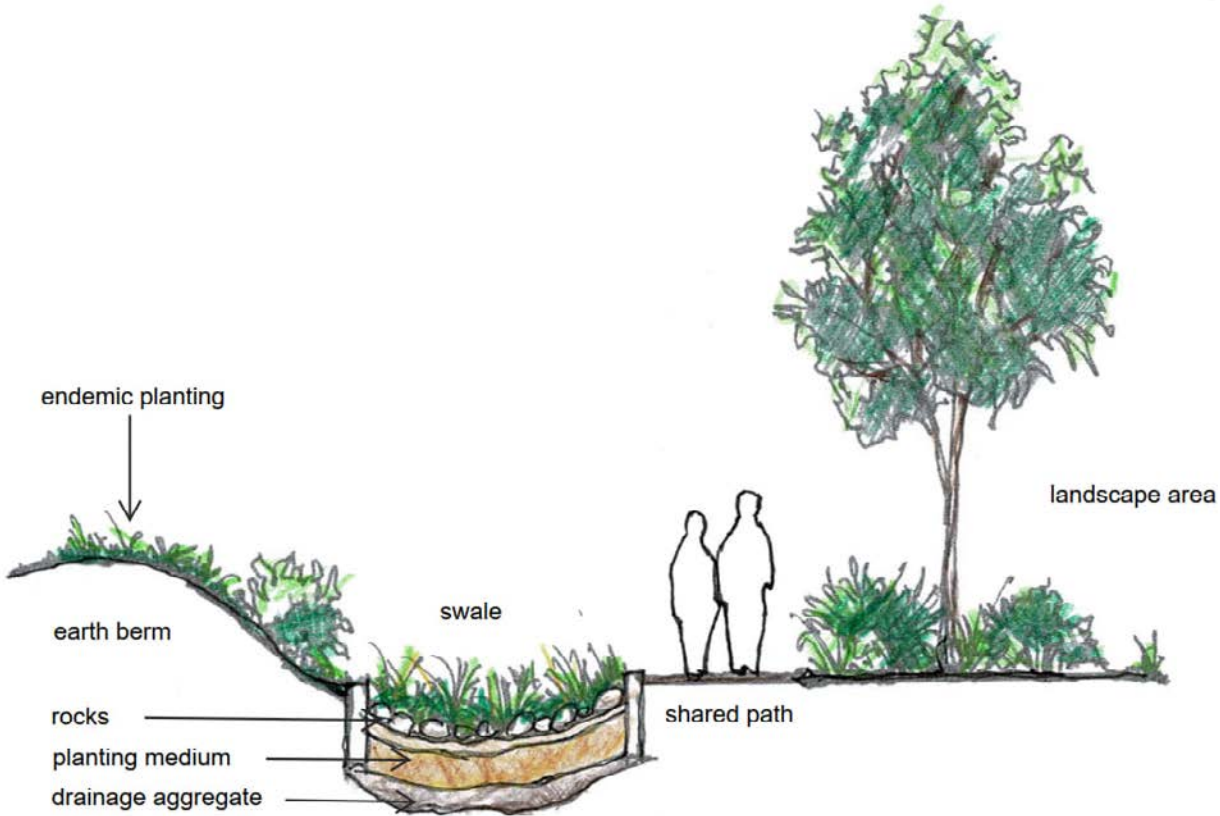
Typical landscape arrangement including drainage swale / rain garden
